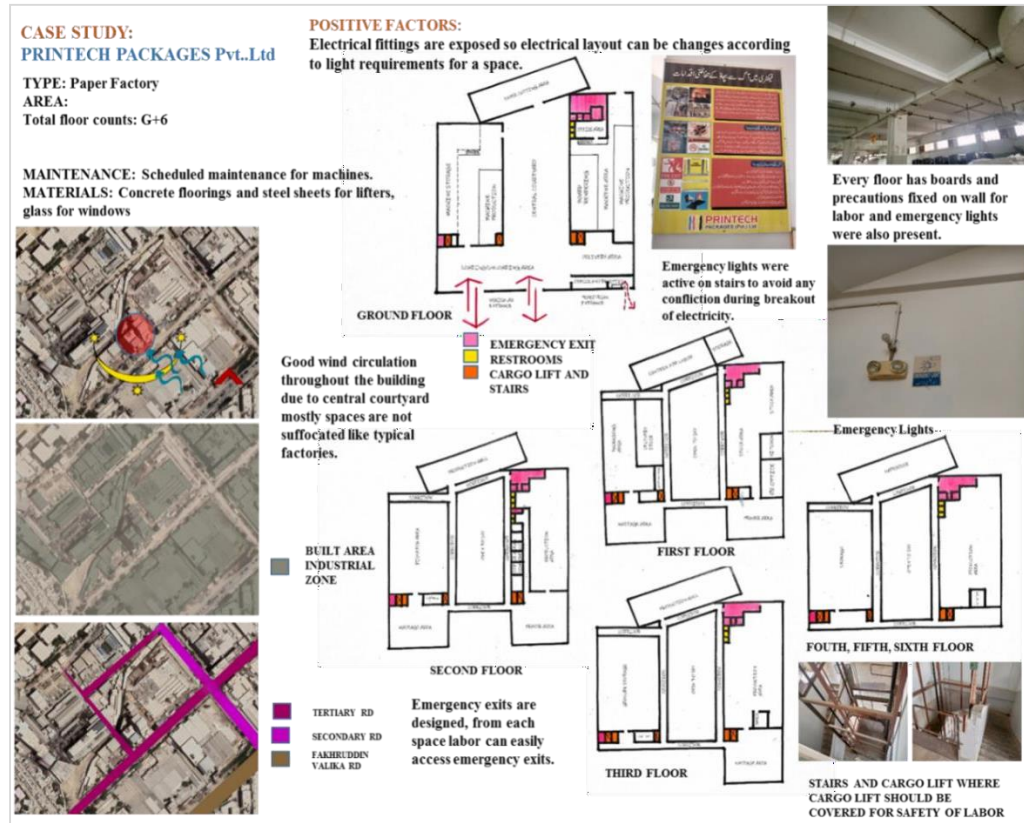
Analysis of spatial layout of factory building (Source: Author)
